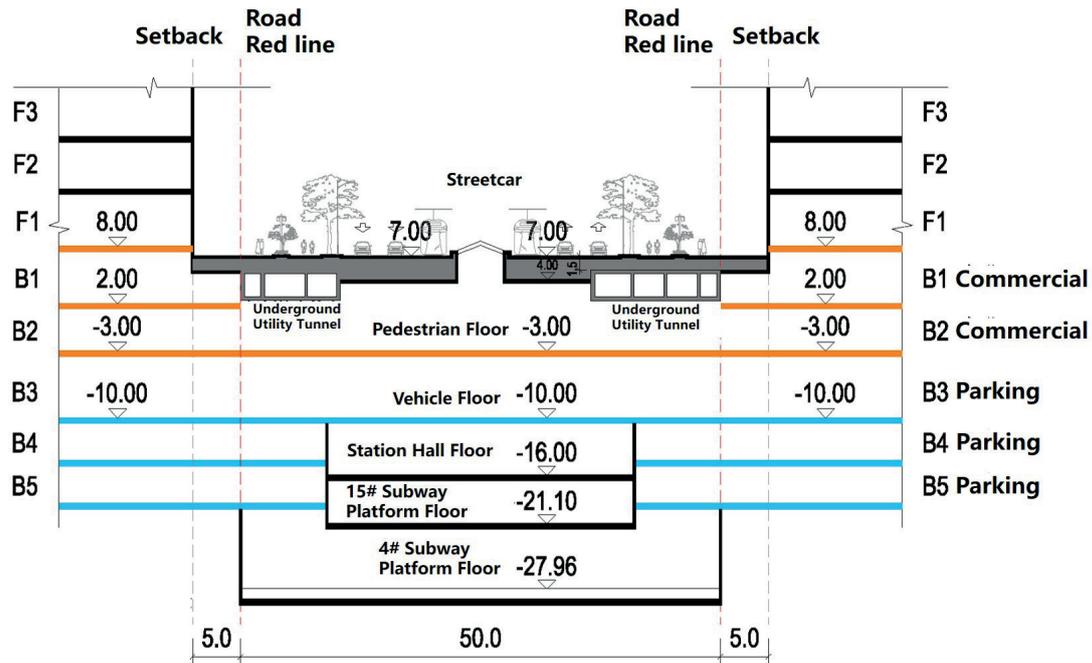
A typical section in the urban design of the CBD district in Jiangbei New Town, Nanjing.
